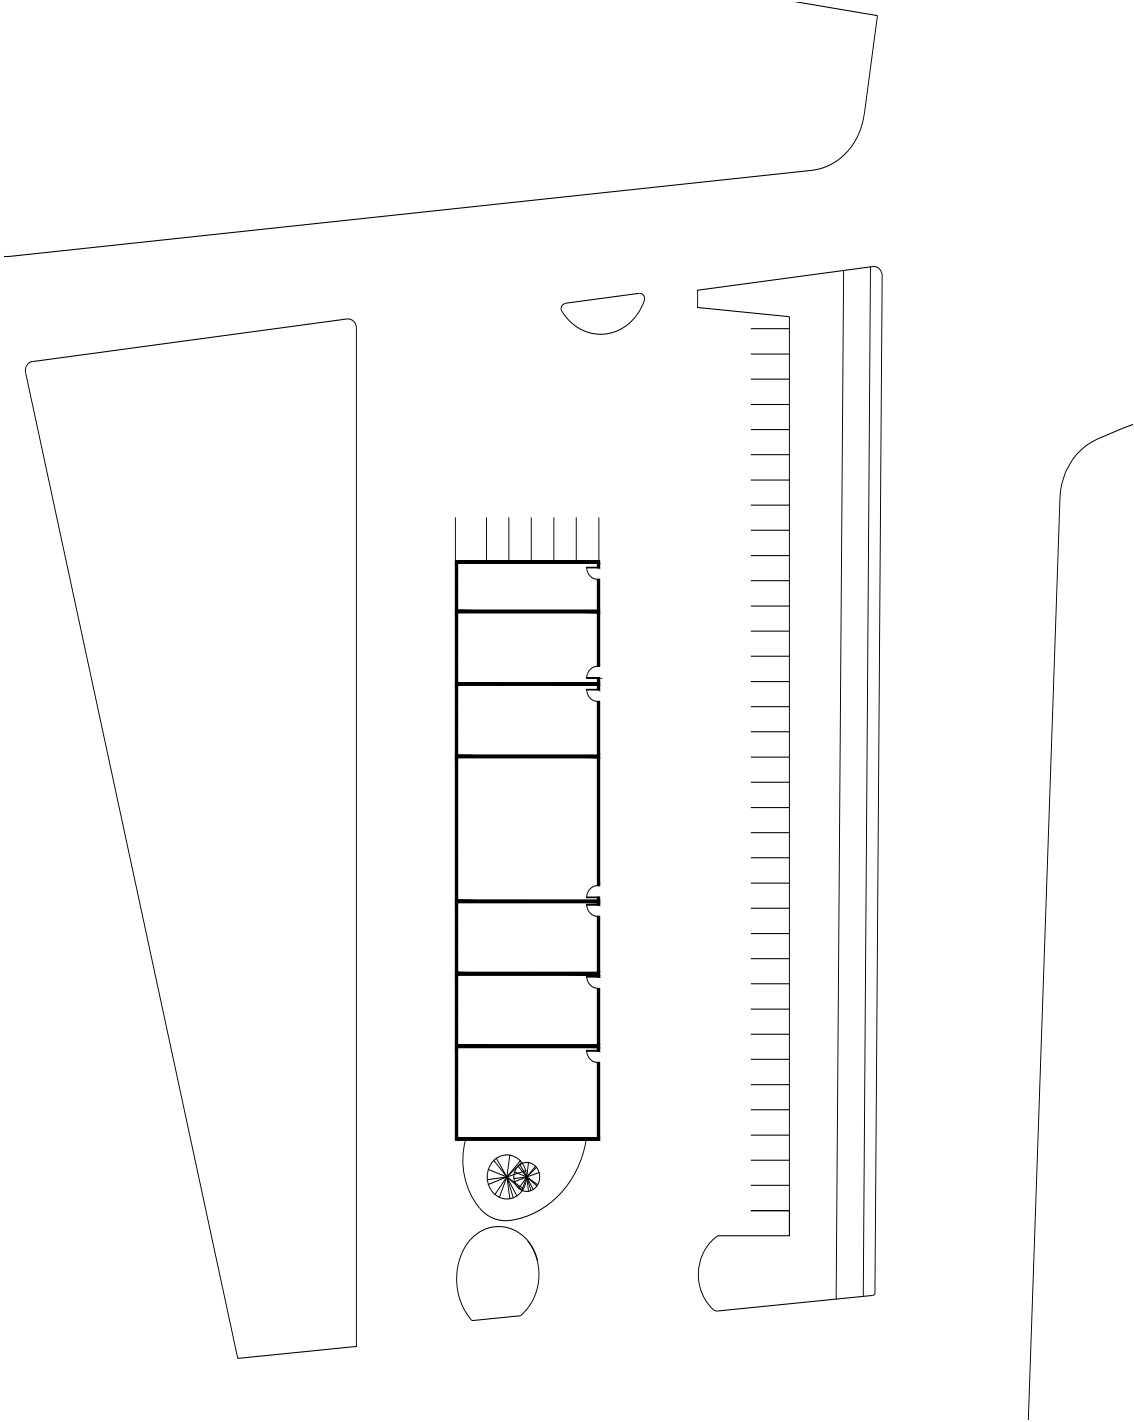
Existing site “number one” on Yonge street, the current plan of plaza on site
